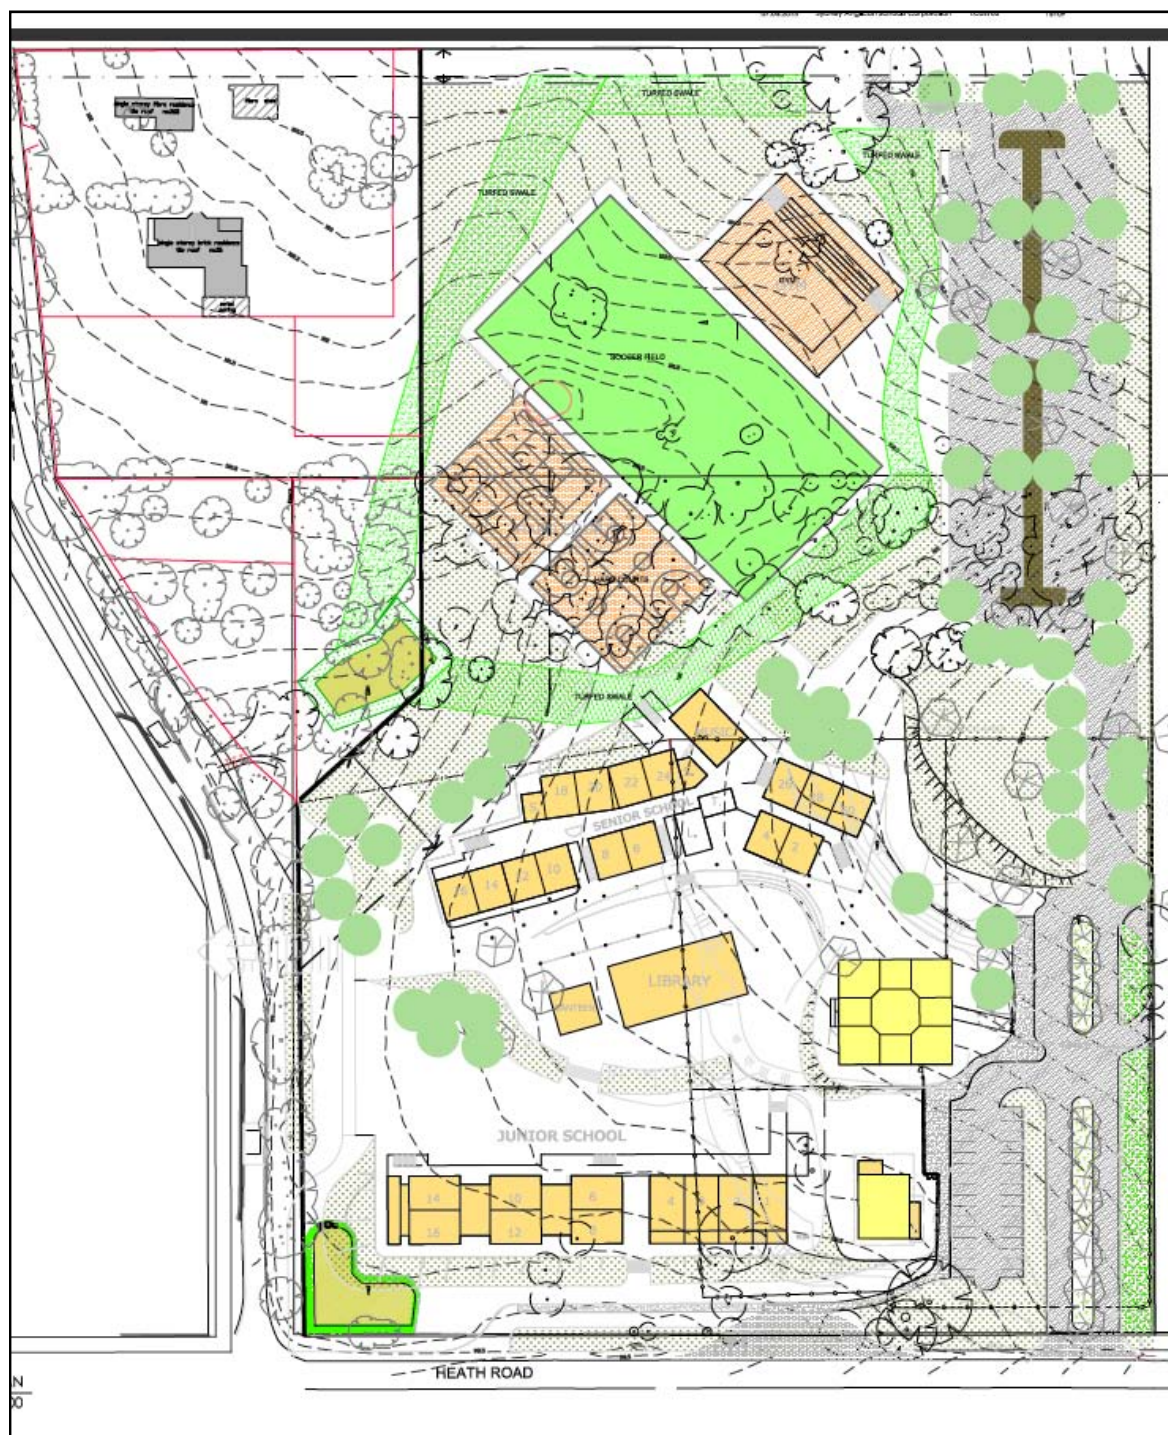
Landscape plan Staged Development- concept approval only sought
